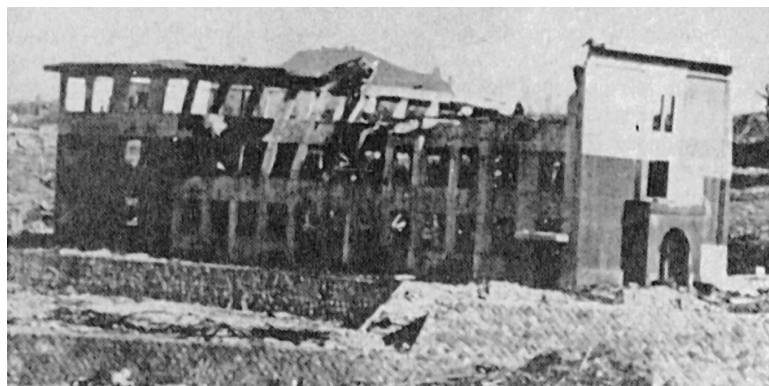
Three-story, reinforced-concrete frame building in Nagasaki after exposure to overpressure of about 31–35 kPa (0.66 km from ground zero). Note partial collapse of the facing, upstream wall. From Glasstone and Dolan (1977).
